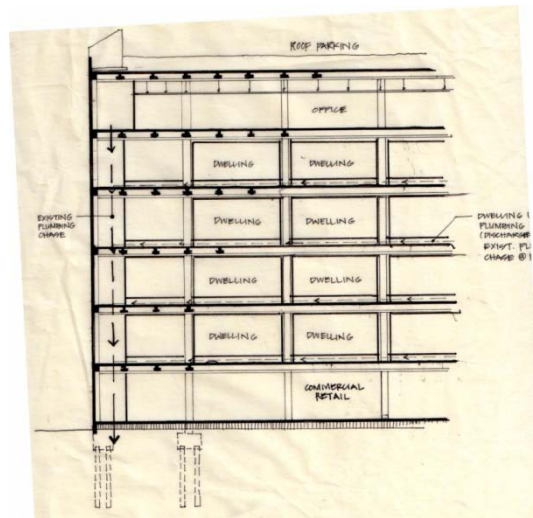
Partial Longitudinal Section Sketch Illustrating Sewer Discharge²⁵¹
